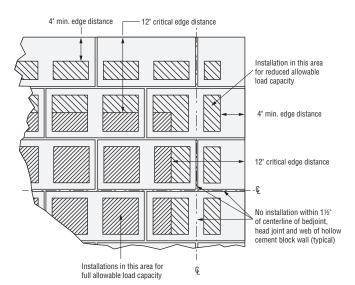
Allowable Anchor Locations for Full and Reduced Load Capacity When Installation Is in the Face of Hollow CMU Masonry Wall Construction
